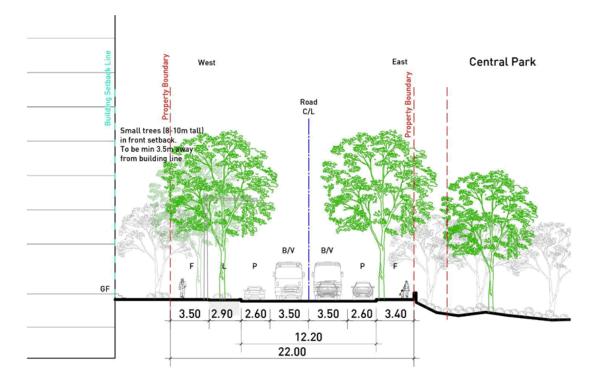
Type 1b Major Road Central Park Interface (NSR 2 between EWR 4 and EWR 6)
